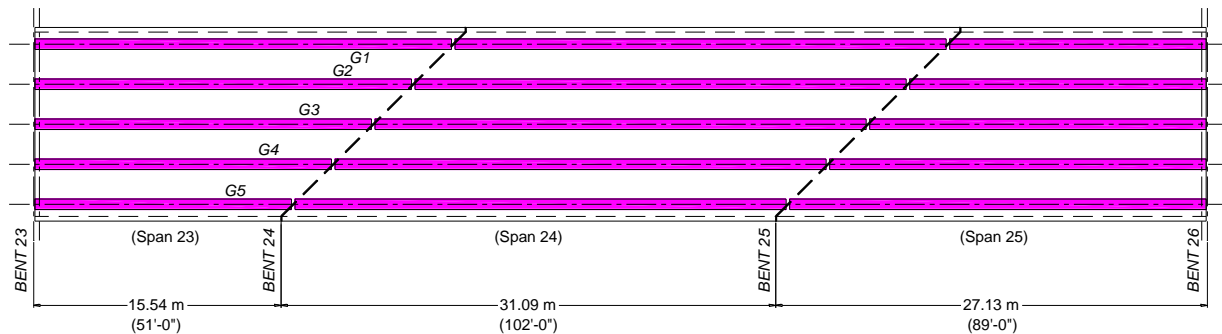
Plan view of Bridge #2 showing different girders and spans
